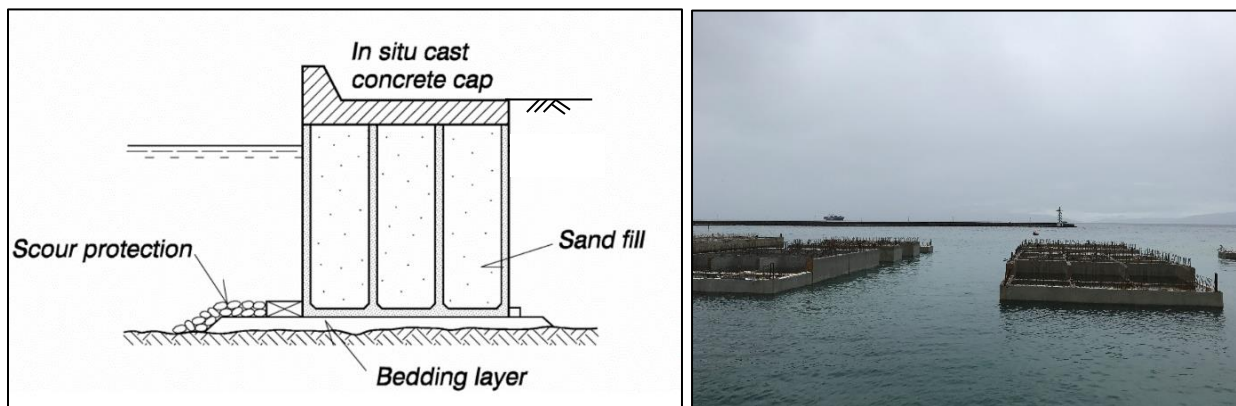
Caisson seawall cross-section (Burchart & Hughes, 2012) and caisson under construction
